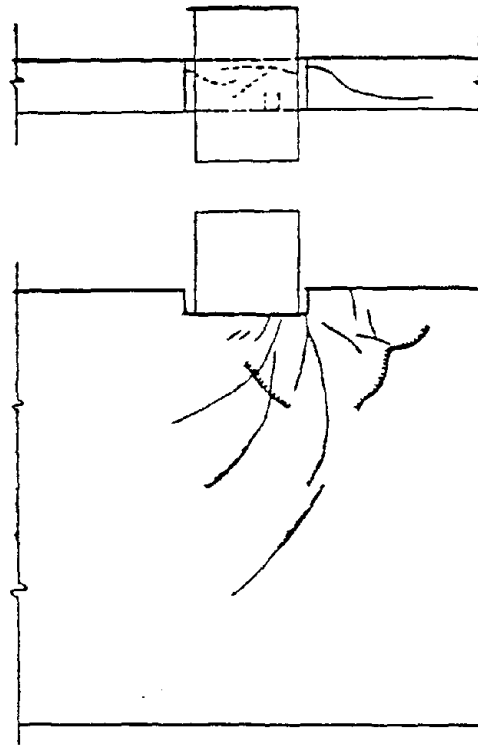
TYPICAL CRACK PATTERN OF TORSIONAL ELEMENT REFERENCE(30)
